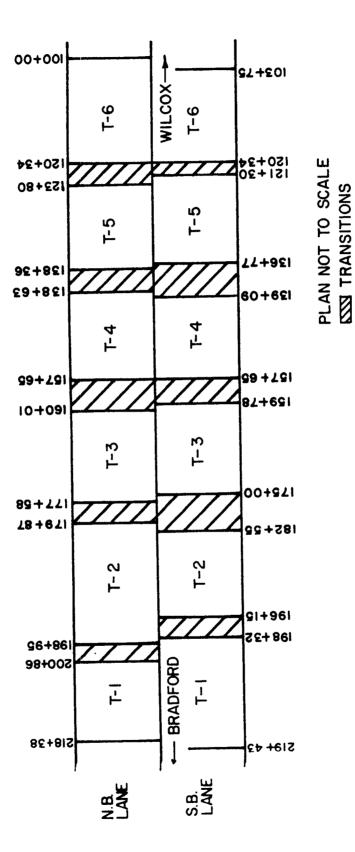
Pennsylvania test sections (stations are given in feet)
